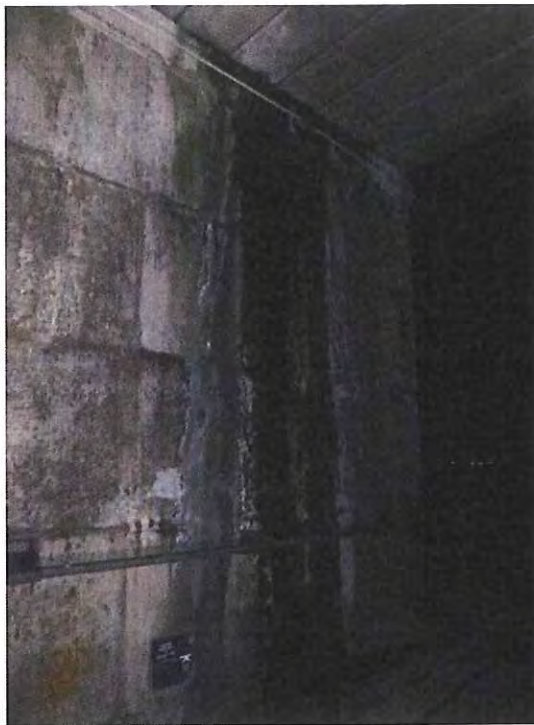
DEFECT: - Cracking on Abutments
